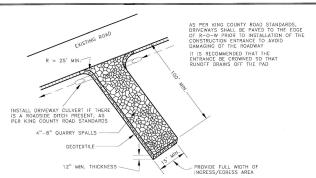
A. STABILIZED CONSTRUCTION ENTRANCE
